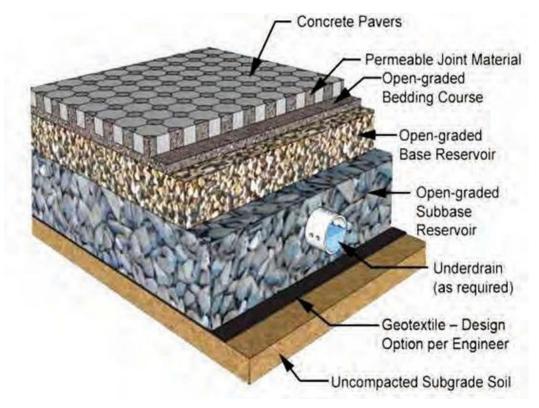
Cross-section of permeable pavement (source: ICPI).
